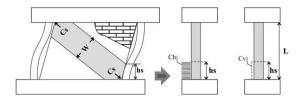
Modeling of masonry infill and distributed strut forces at the column-infill interface
